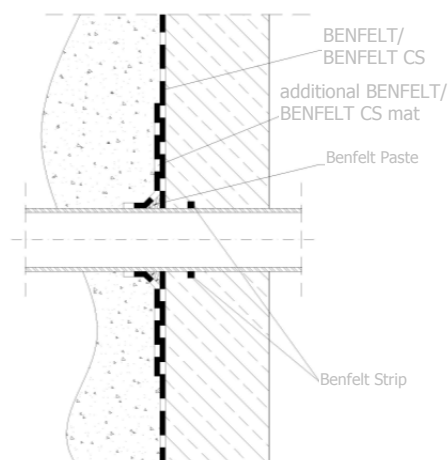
Sealing of the installation pipe penetration through the foundation wall.
